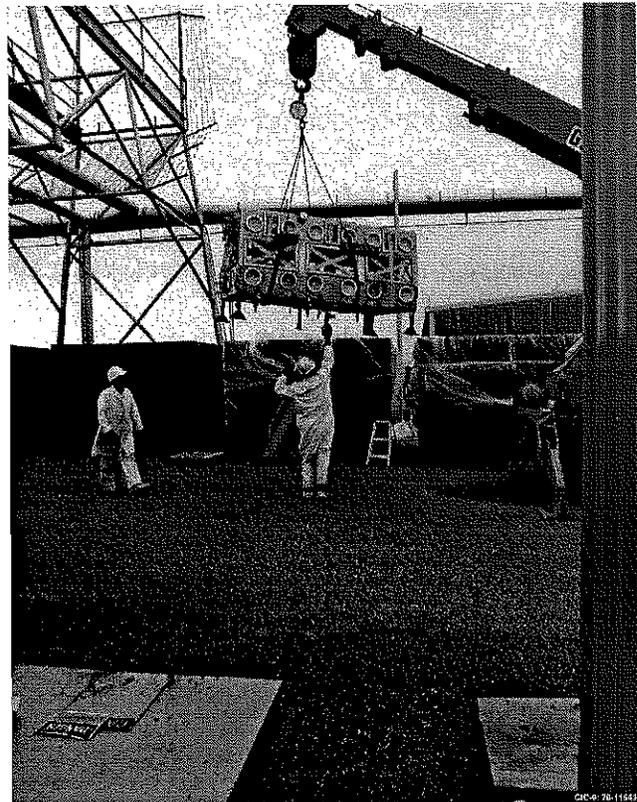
Craftsmen remove contaminated lines from a section of floor.
